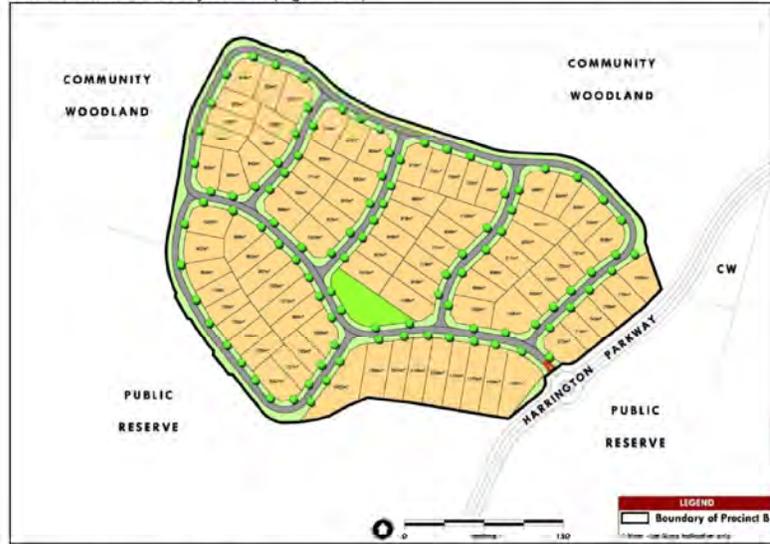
Harrington Park Precinct B Indicative Lot Layout Plan
